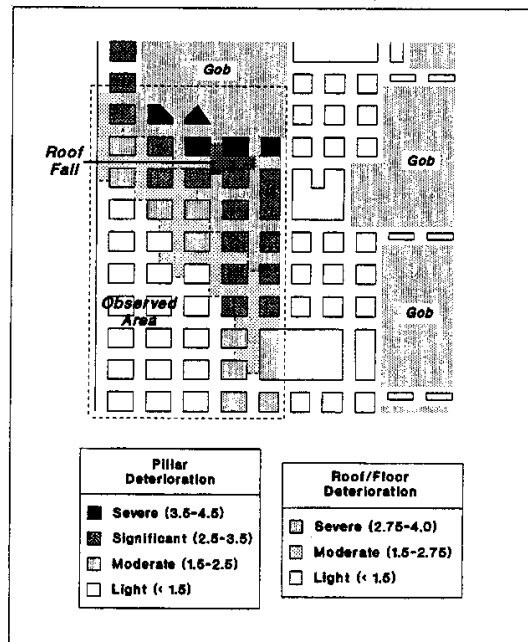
Mine A: Observations on Pillaring Section - Roof Fall Area.
